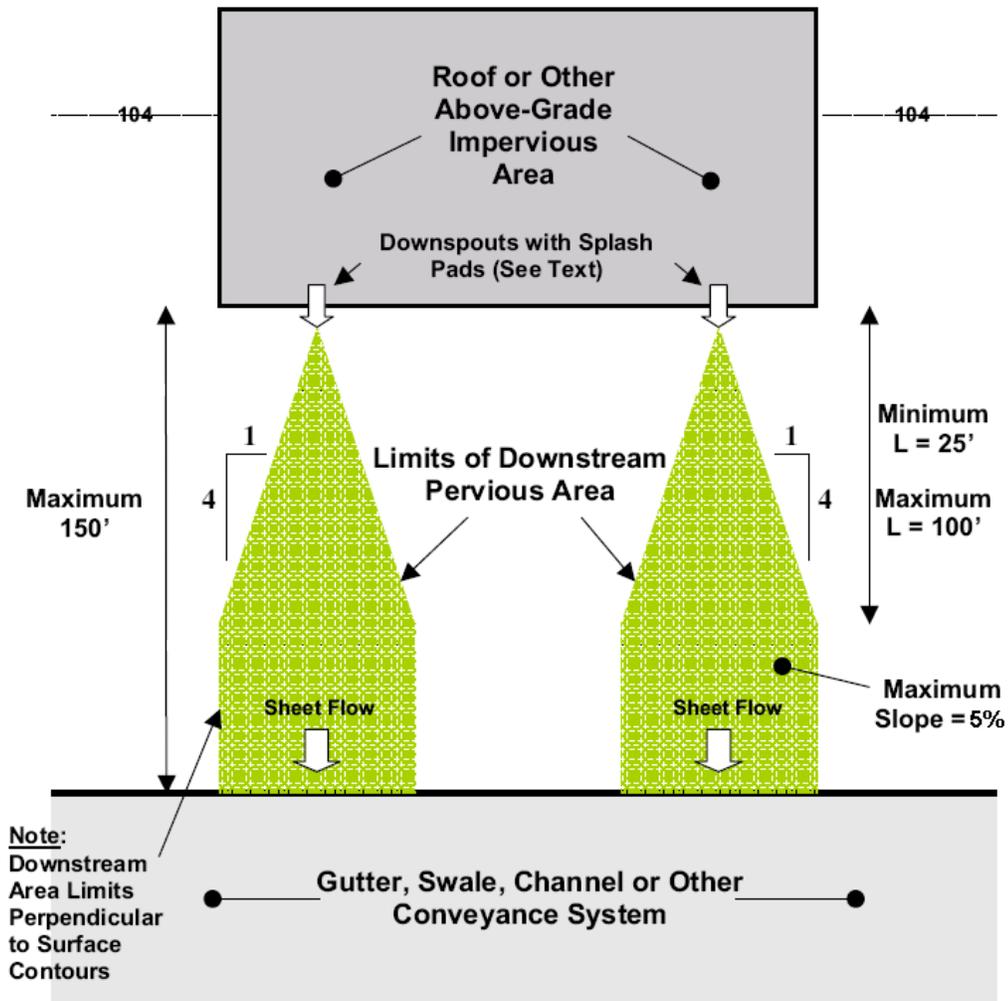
Standards for disconnecting impervious surface via downspouts. Source: Adapted from New Jersey Department of Environmental Protection, 2004.
